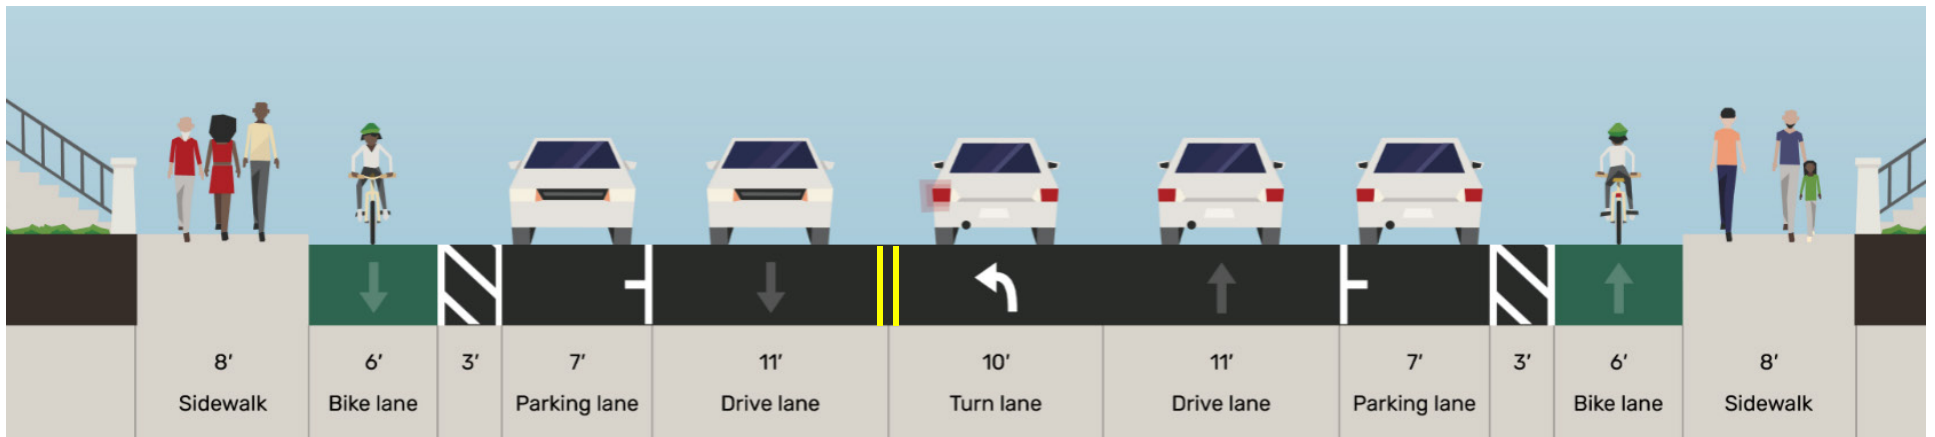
Proposed cross-section: W 120th St from Inglewood Ave to Prairie Ave
